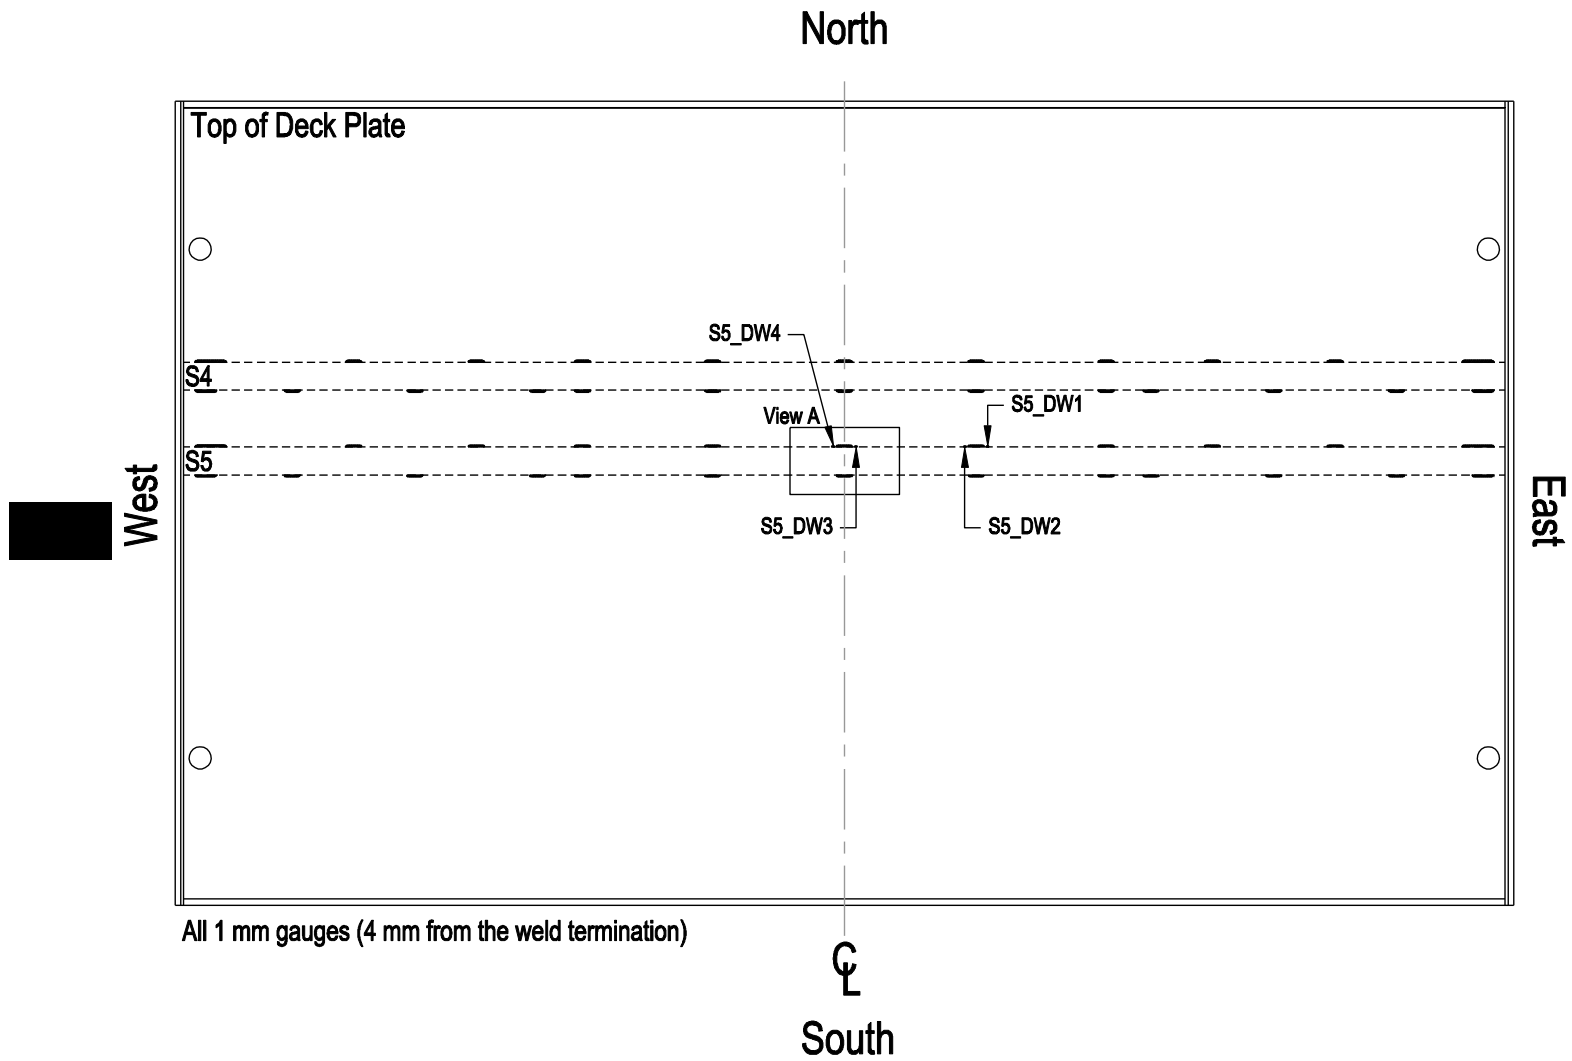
Strain gauge layout for Specimen #1 of stringer-to-deck welds
